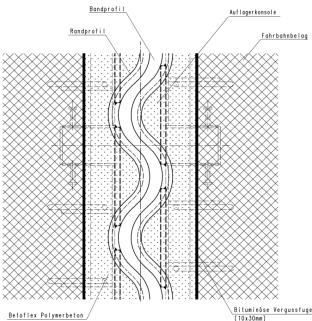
Retrofit of a multi seal expansion joint into a single seal wave shaped expansion joint, section and ground view
